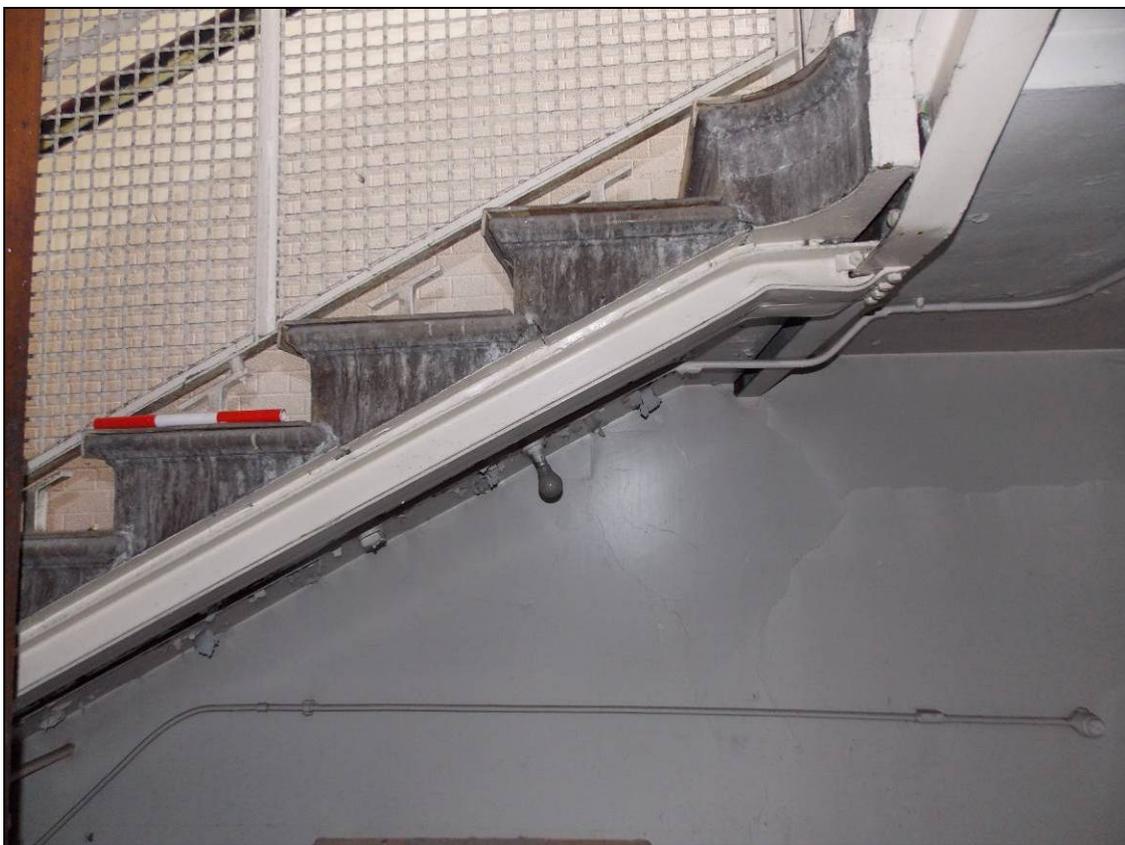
Detail of moulded cut string, looking south (scale 300mm).
